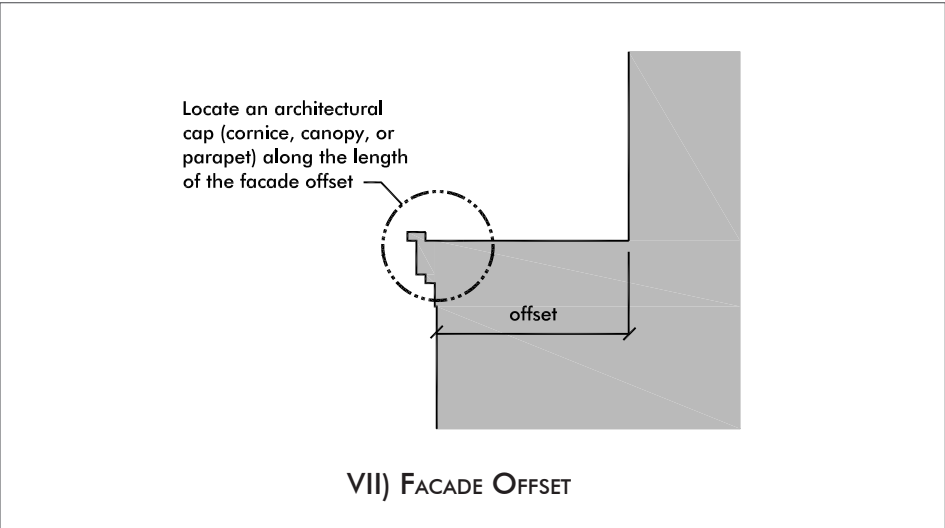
B.7 FACADE ARTICULATION ELEMENTS
